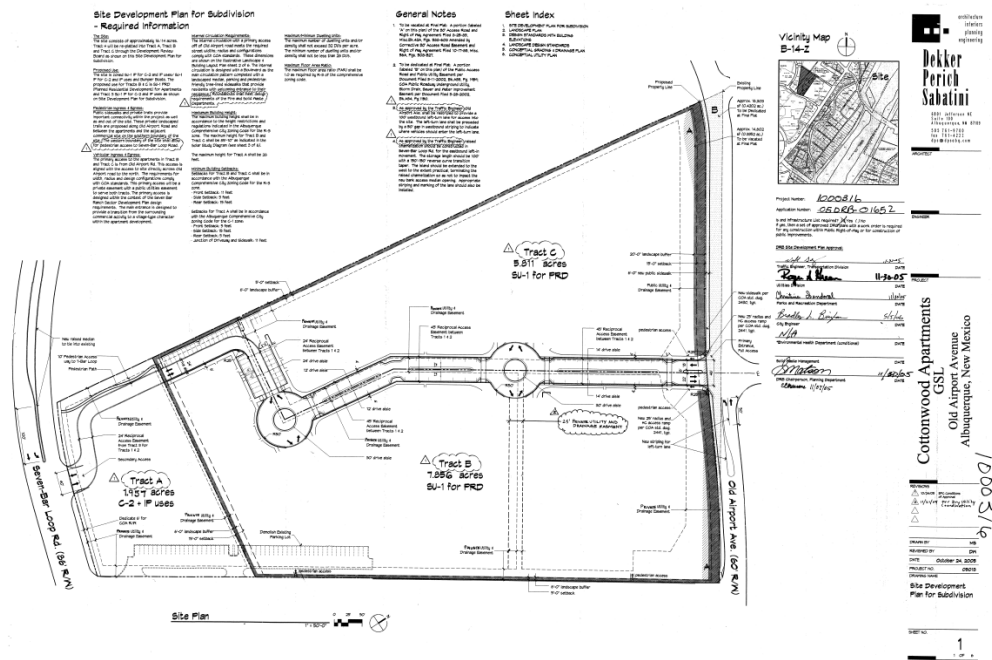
Existing Controlling Site Development Plan for Subdivision (Tracts A will be Abandoned with Approval of this Request, as Highlighted in Figure 2).
